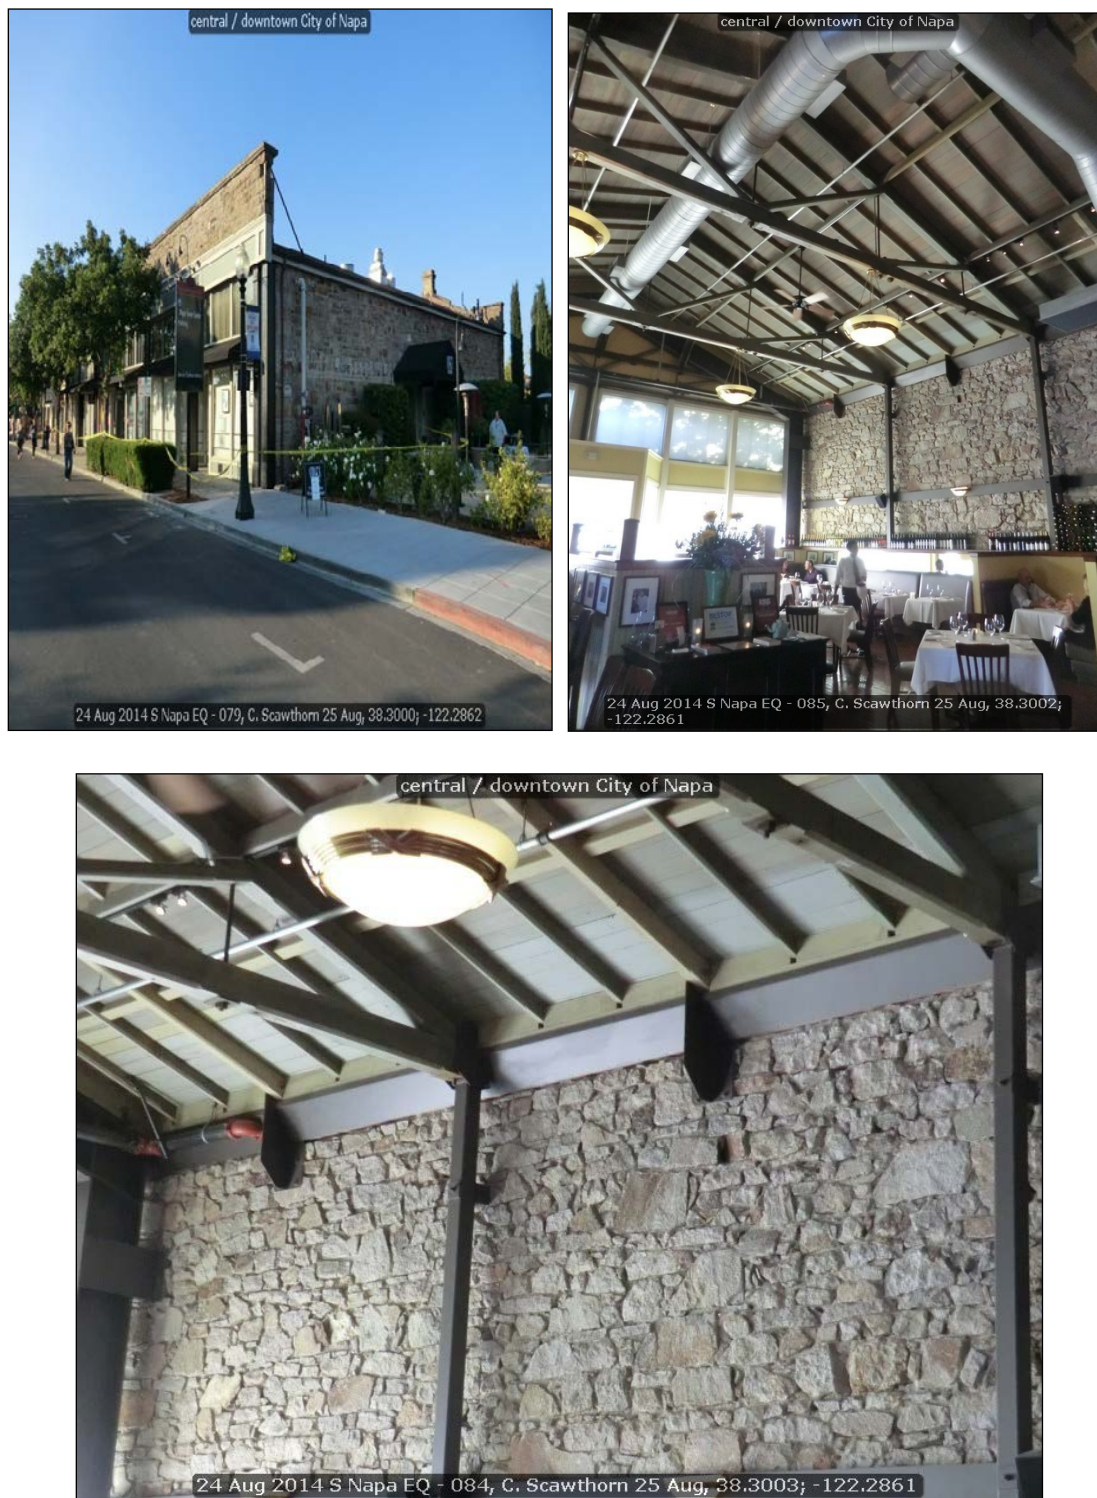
Restaurant building Main Street Napa, field stone URM retrofitted, with only minor damage – building was yellow tagged with notation “Guests allowed.”
